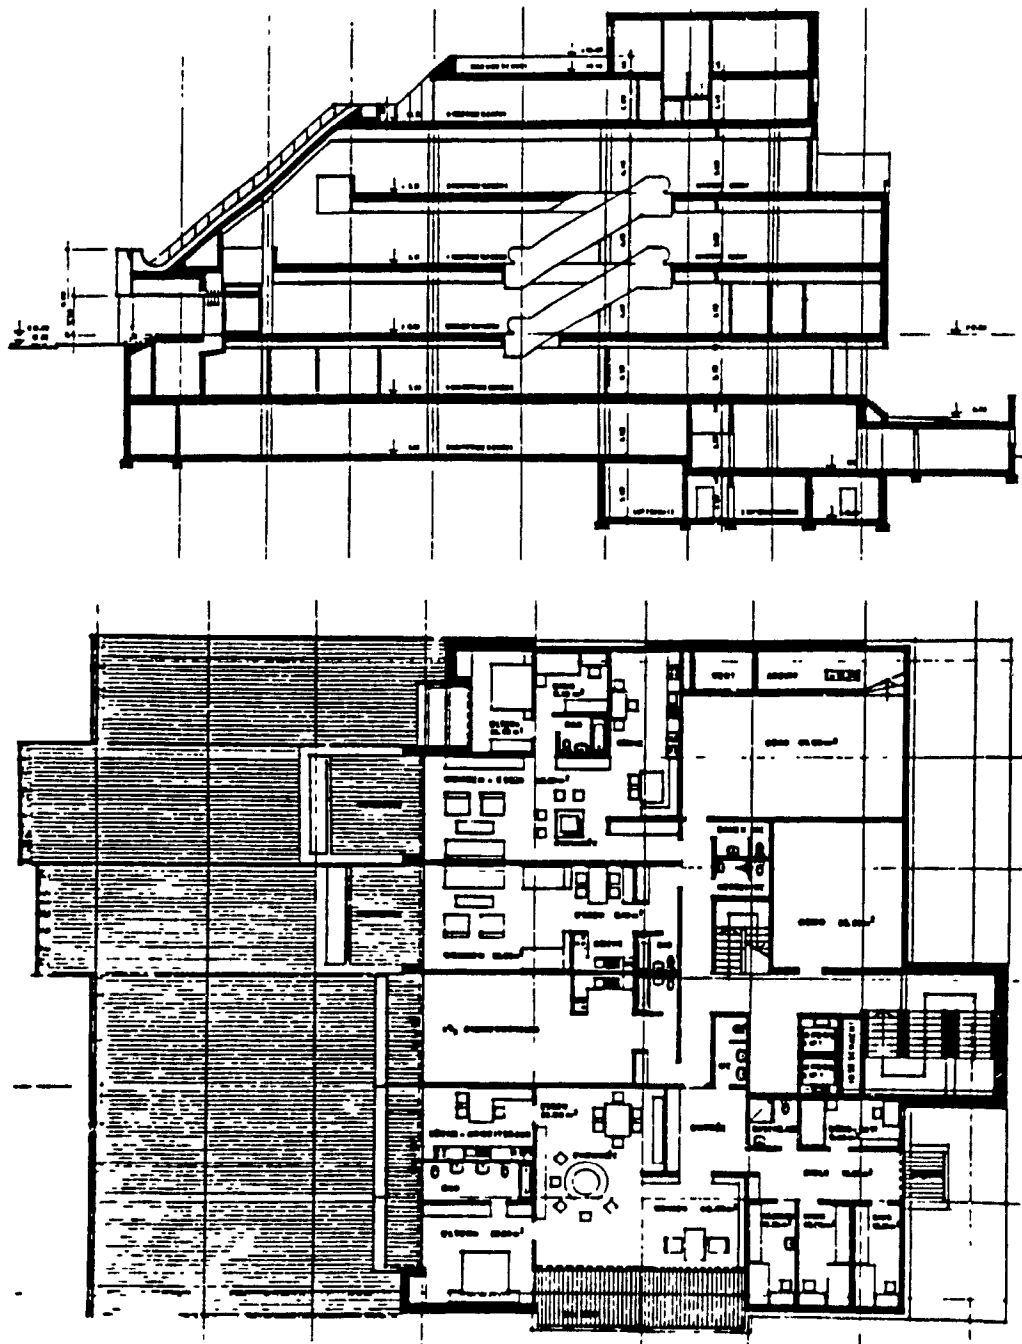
Plan and Section of Gemeinschaftswarenhaus
